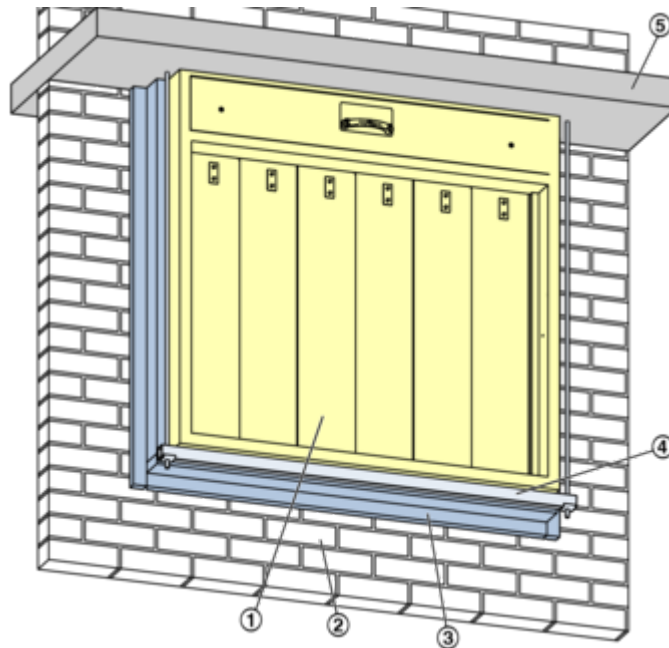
Dry mortarless installation on solid wall EI 90 S_{ew}, solid external wall or solid shaft wall EI 120 S_{edw} - Single occupancy of the installation opening
